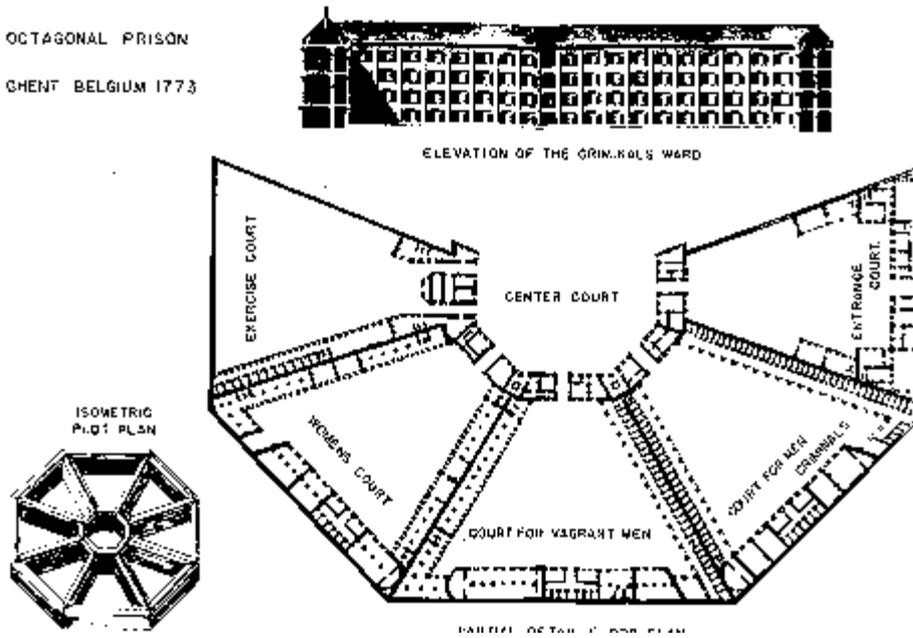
Ghent Floor plan showing radial design.⁵⁵
